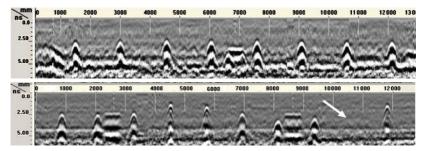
Radargram of dowels positions measurement in concrete road pavement transversal joint – variability of tie bar positions
